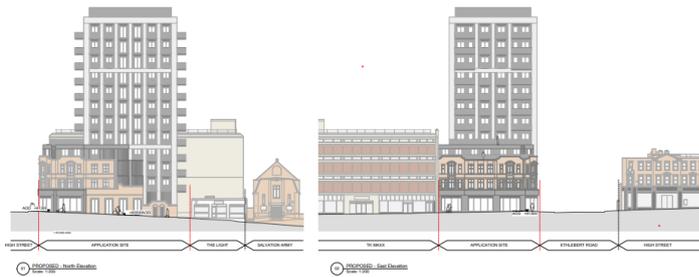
Current scheme (ref: 21/03231/FULL1) – North and East elevations.
